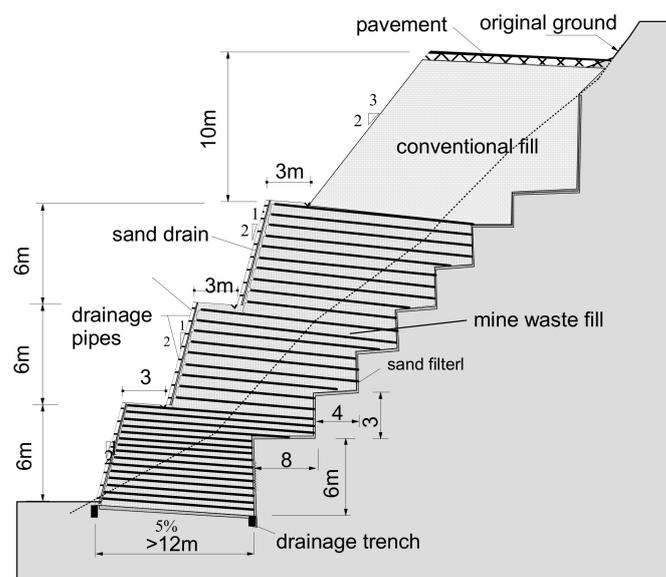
Geosynthetic reinforced structure built with mining waste backfill [87].
